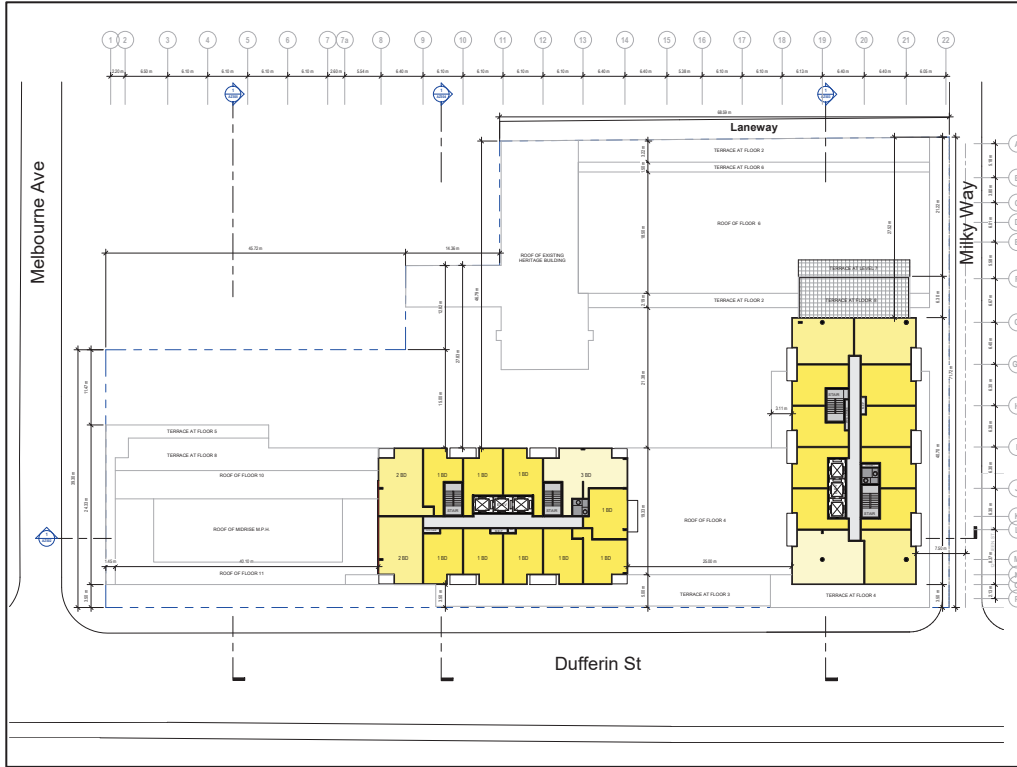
13th - 21st Floor Plan (Sweeny & Co)
